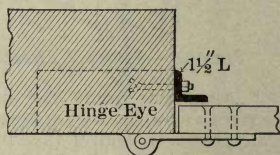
Swing Fire Door in Wall Reveal, Hung to Hinge Eyes.
